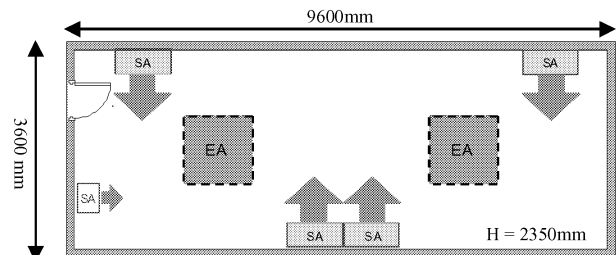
Test room floor plan (layout for the vertical tornado system)
